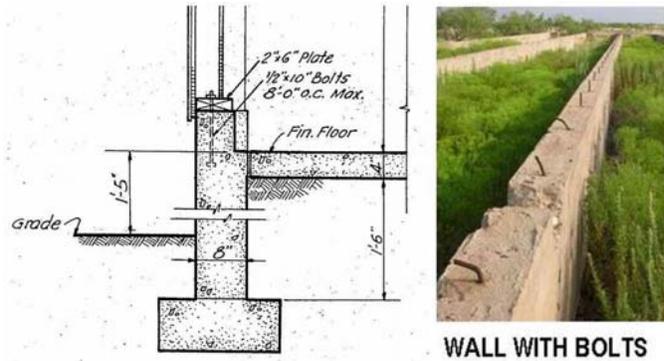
Foundation with bolted sill plate (original drawing and current condition)
